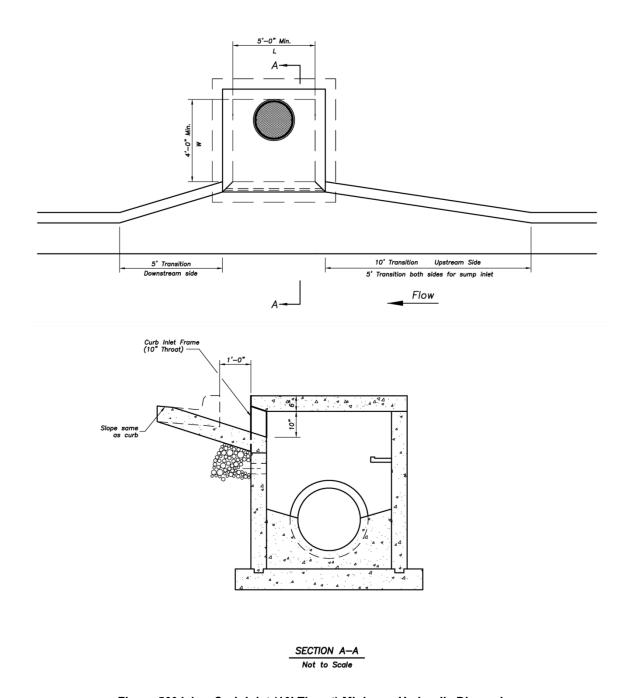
Curb Inlet (10' Throat) Minimum Hydraulic Dimensions
